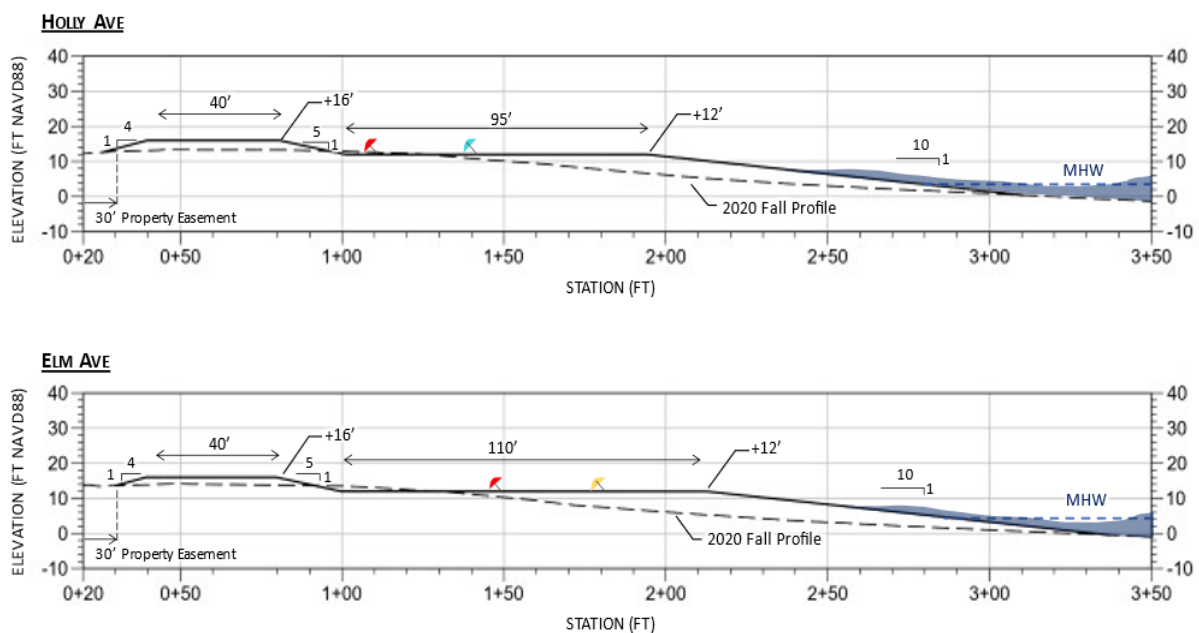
Cross-Section of the Project with a Temporary Pilot Groin with Wider Beach and Single Ridge Dune
